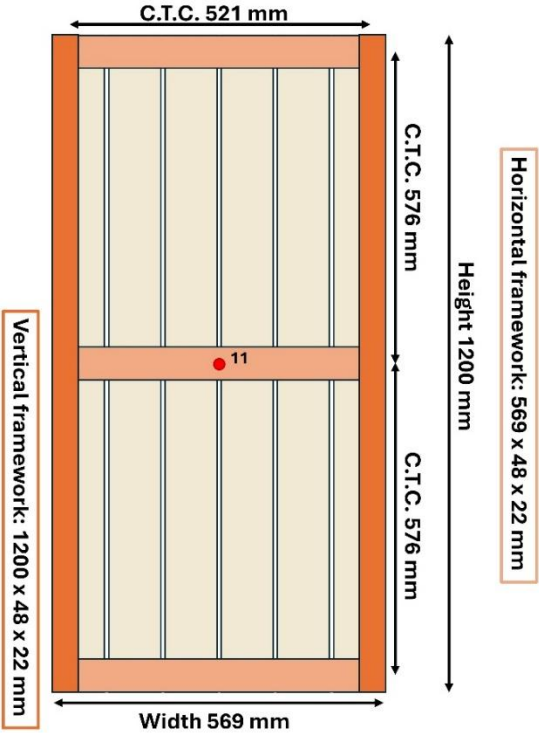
LINE BURNER TEST PANEL – BACK VIEW
